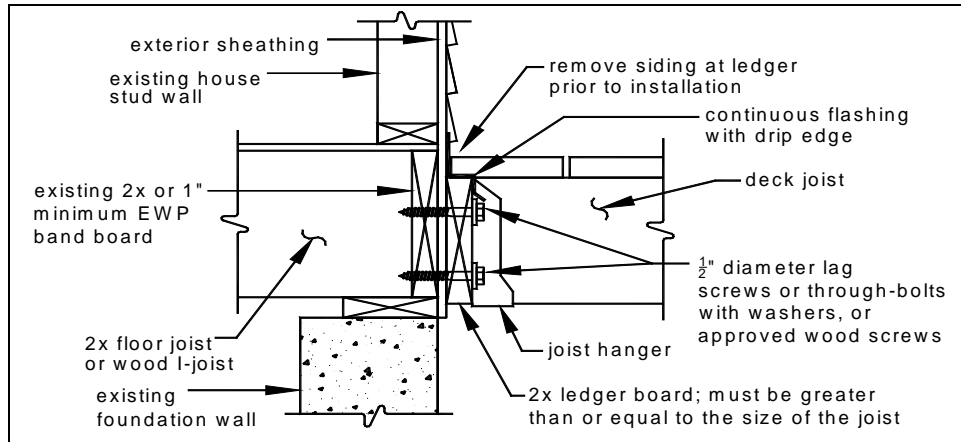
ATTACHMENT OF LEDGER BOARD-TO-BAND BOARD
